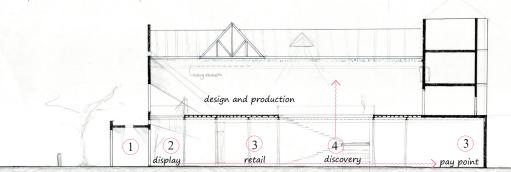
Existing section and plan illustratingi important points within the retail design (Author, 2013)
